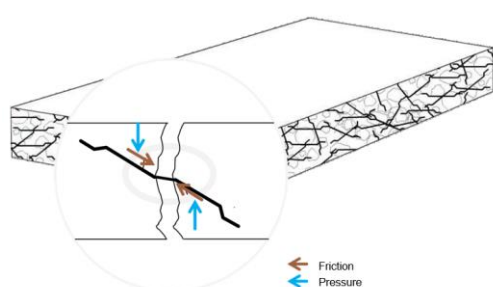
Crack Bridging Mechanism of Steel Fibers
